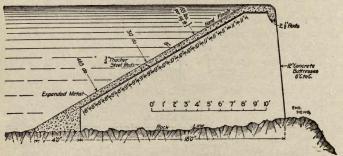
Reinforced Concrete Dam, Theresa, N. Y.
